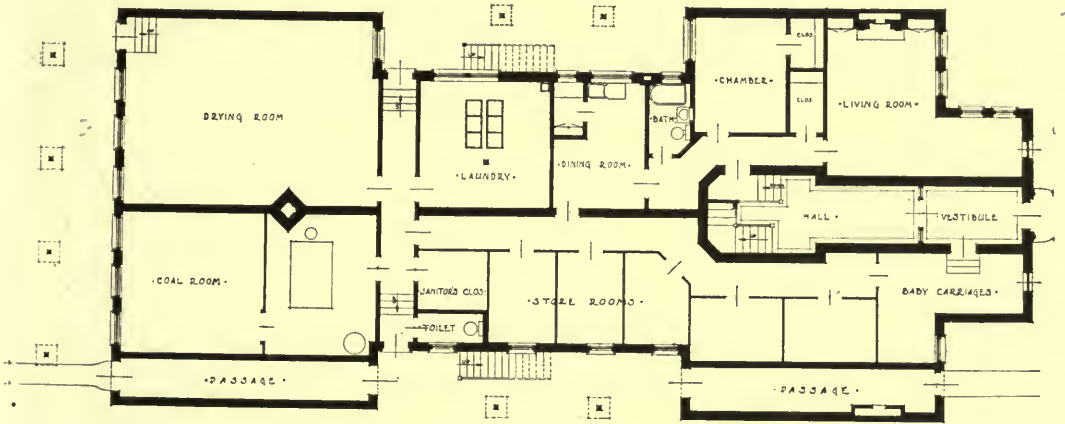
H. H. BENTLEY APARTMENT, 6914 SHERIDAN ROAD, CHICAGO, ILL. H. H. BENTLEY, ARCHITECT.
